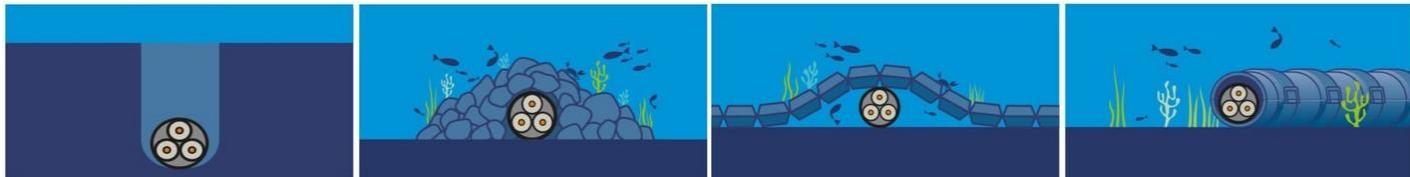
Illustration of the different type of cable protection. From left to right: Buried, Riprap, Concrete mats, and Protective shells © RTE
